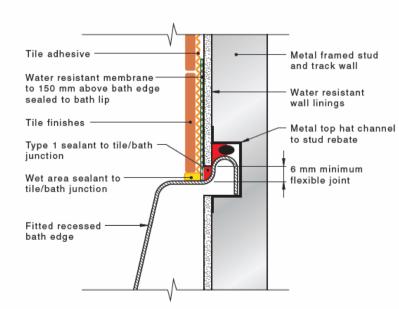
(C) — Bath with no shower over it — Fitted bath — Metal framed wall
